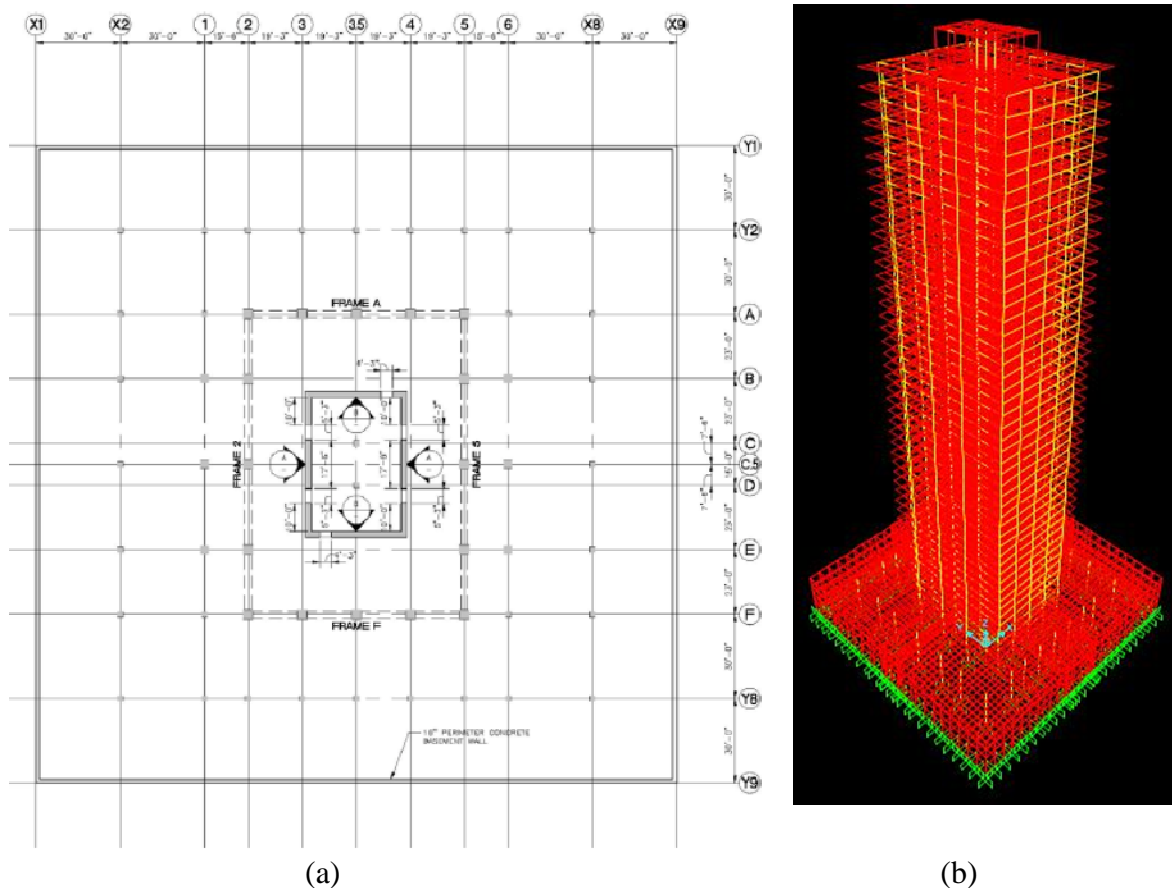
(a) Typical plan view at ground floor and below (Moehle et al., 2011); (b) Three dimensional rendering of structure from PERFORM-3D model.
